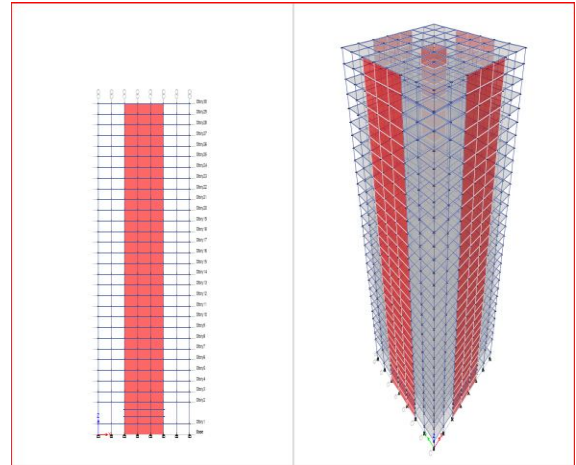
Elevation and 3-d view of Soft Story model with horizontal stiffeners
